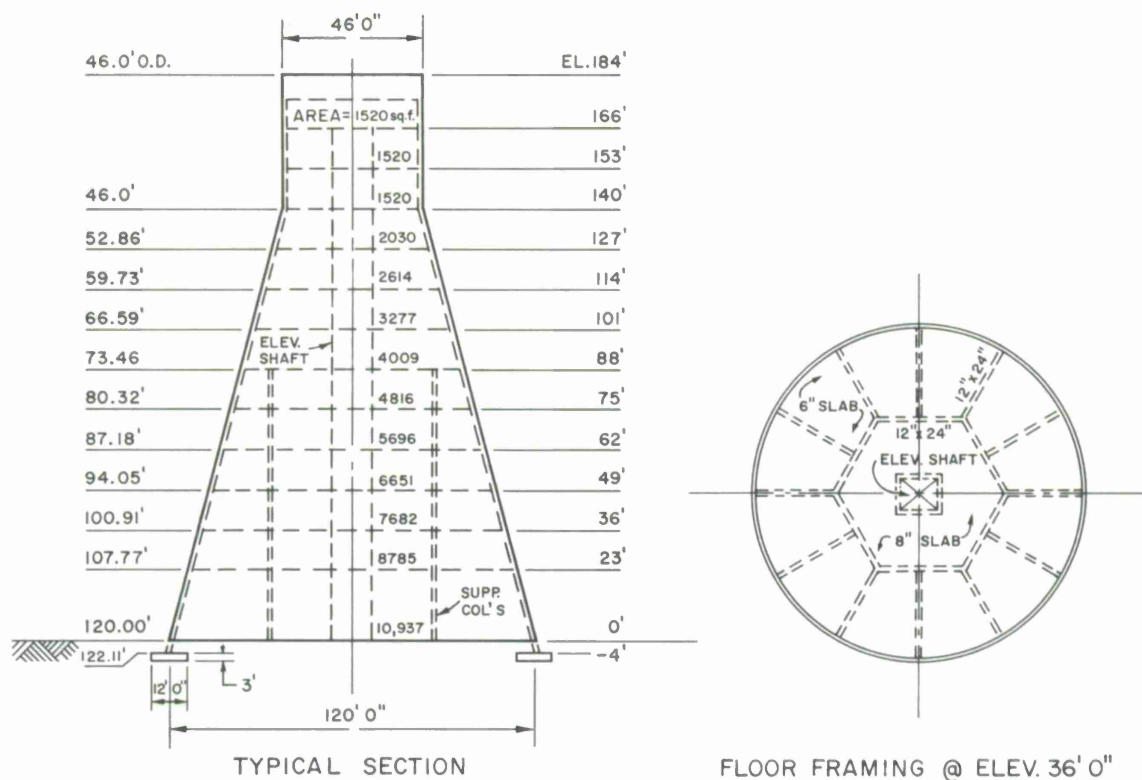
Concrete tower for Hammerhead antenna, showing cross section and typical floor framing, with floor elevations and areas.
